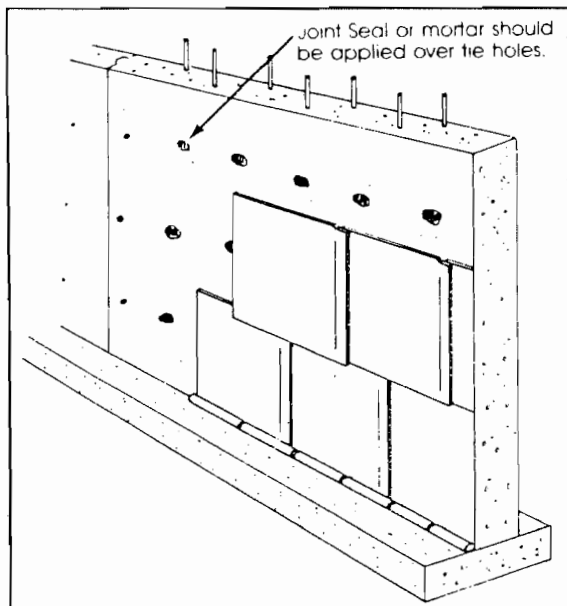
Bentonite Panel Installation (American Colloid Co.)
